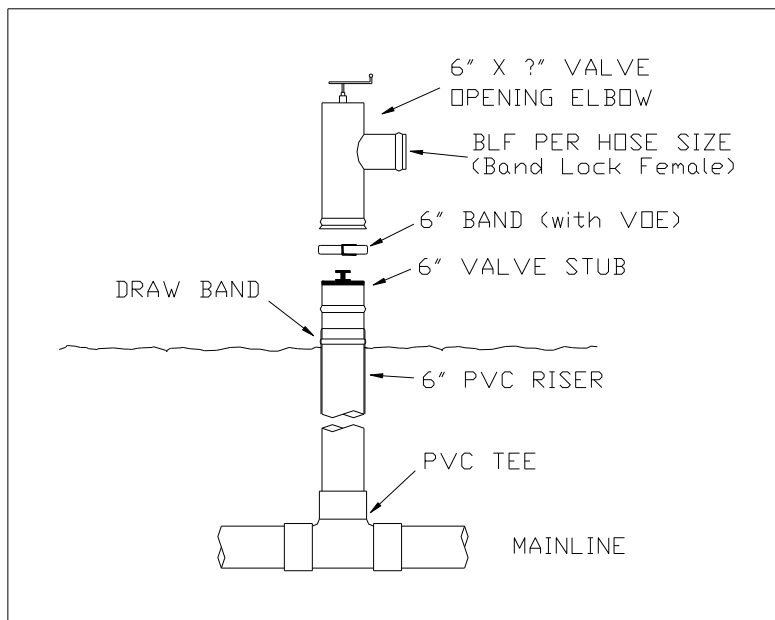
Tractor Inlet to Riser and Guidance Dimensions
